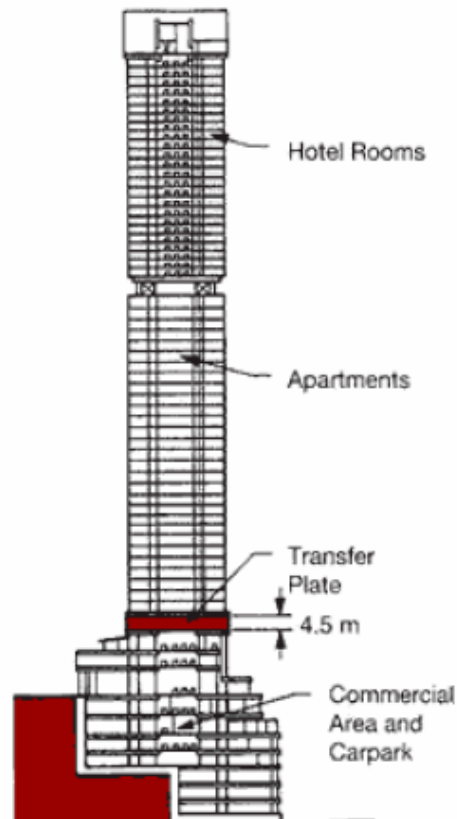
An example of use of post-tensioned transfer plate in a high rise building. [13]
